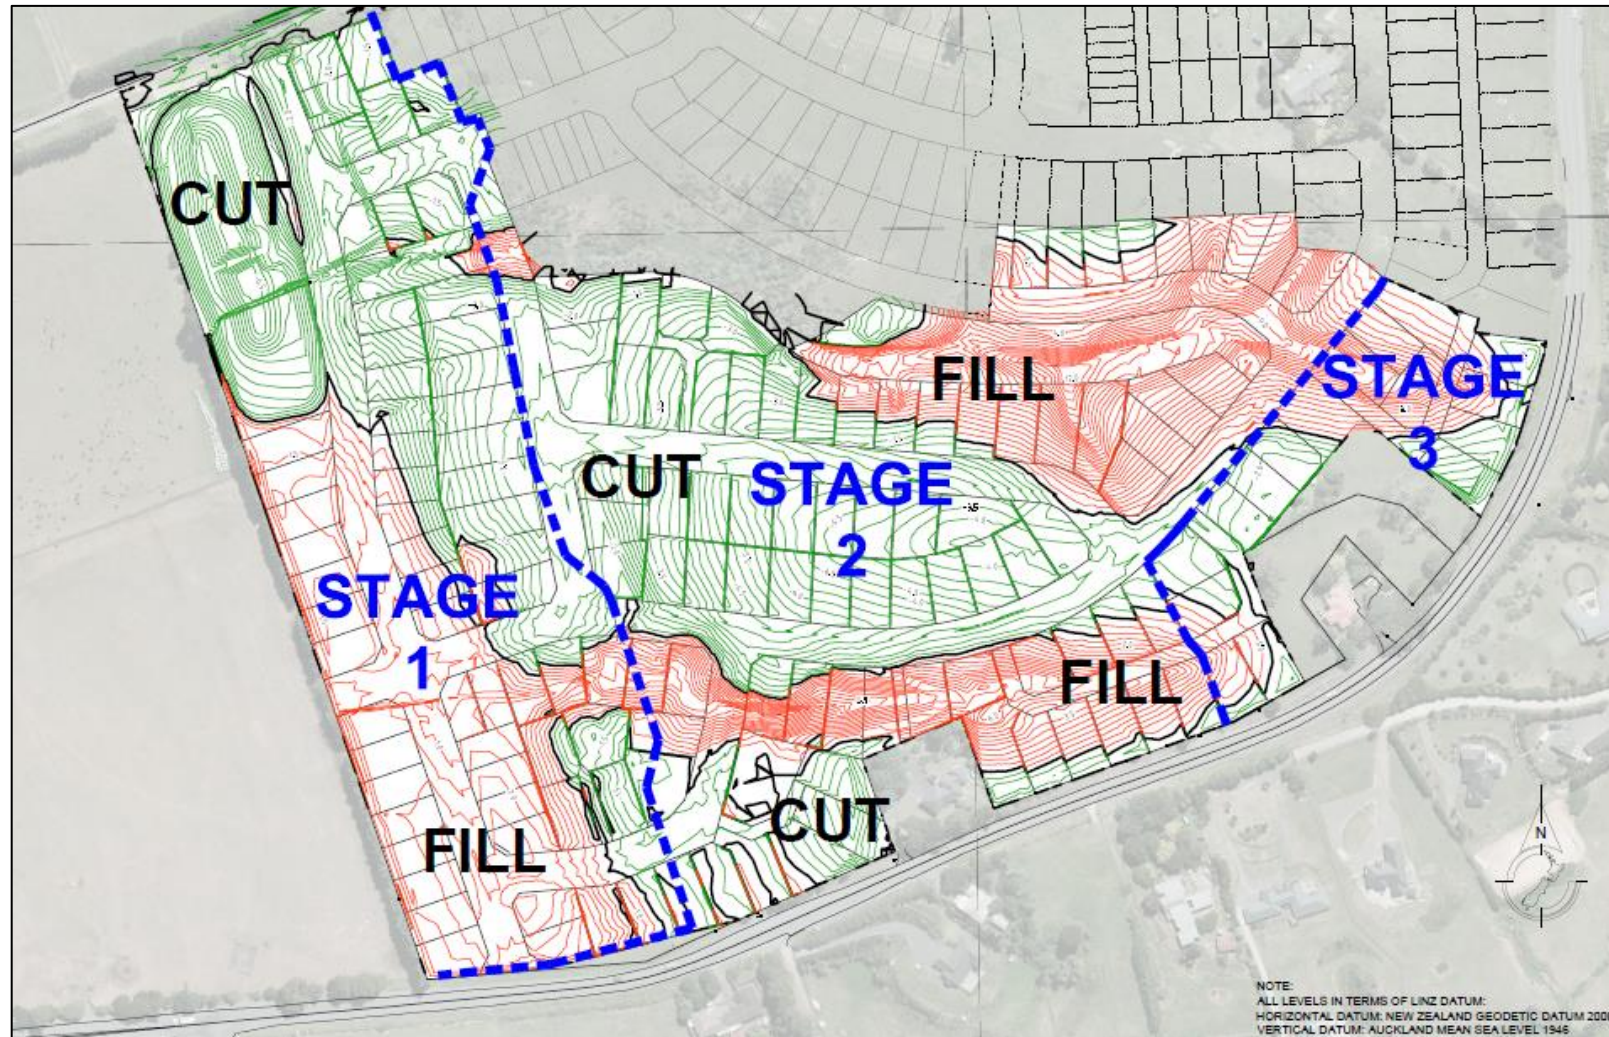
Plan of proposed earthwork staging plan at 949 Old Wairoa Road and 935-973 Papakura-Clevedon Road (the green represents cut areas and the red fill areas)
